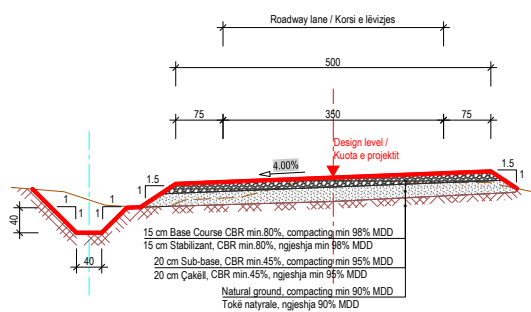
Typical Cross section No. 6 - Agricultural Road
